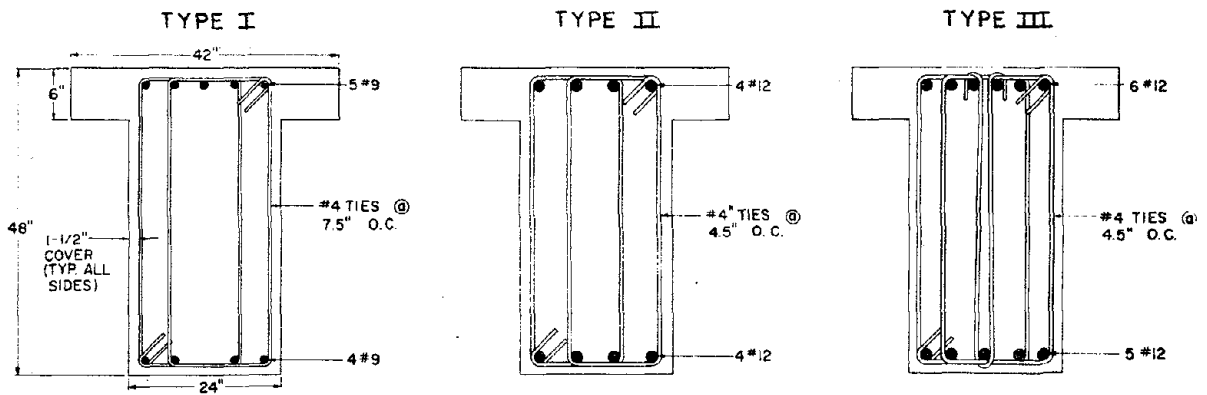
COUPLING GIRDERS DESIGNED BY UBC-73 PROVISIONS
